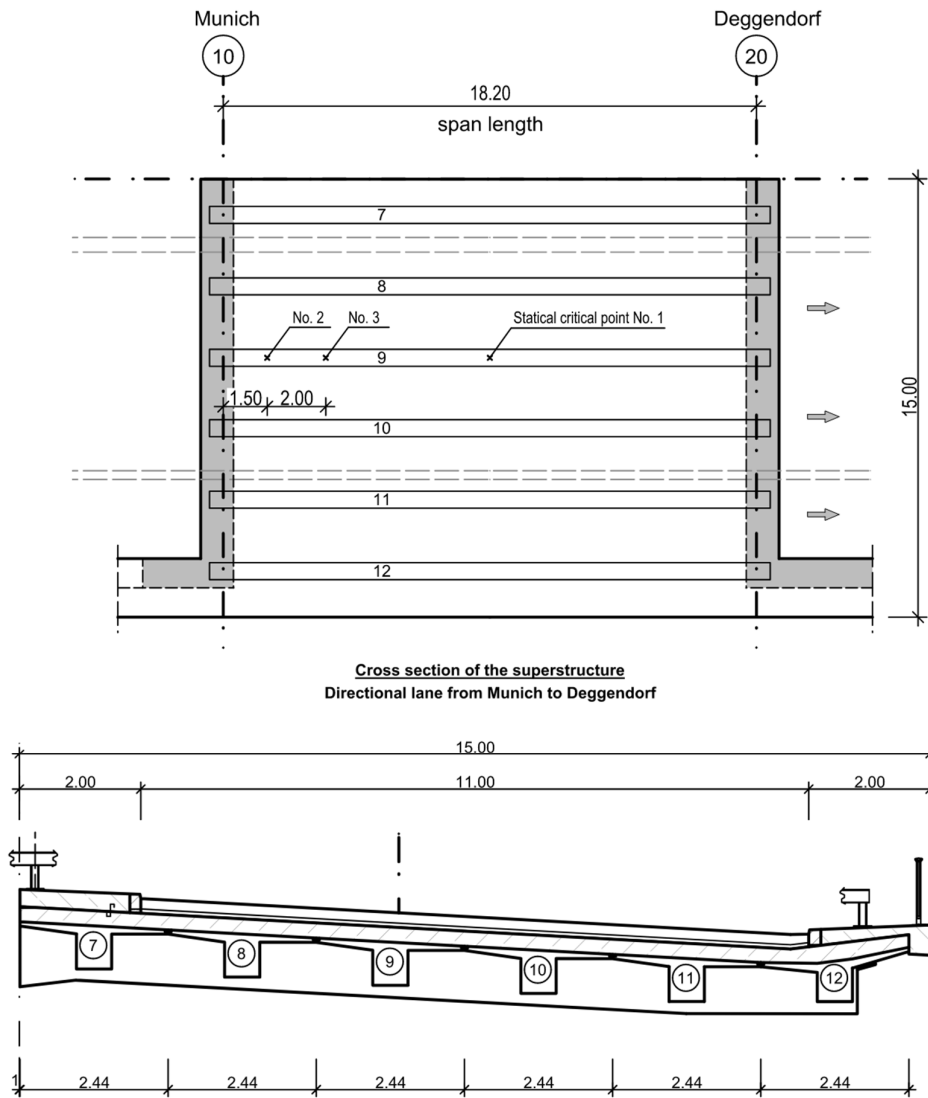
Top-view and cross section of the single-span PC bridge with partly prefabricated T-beams
